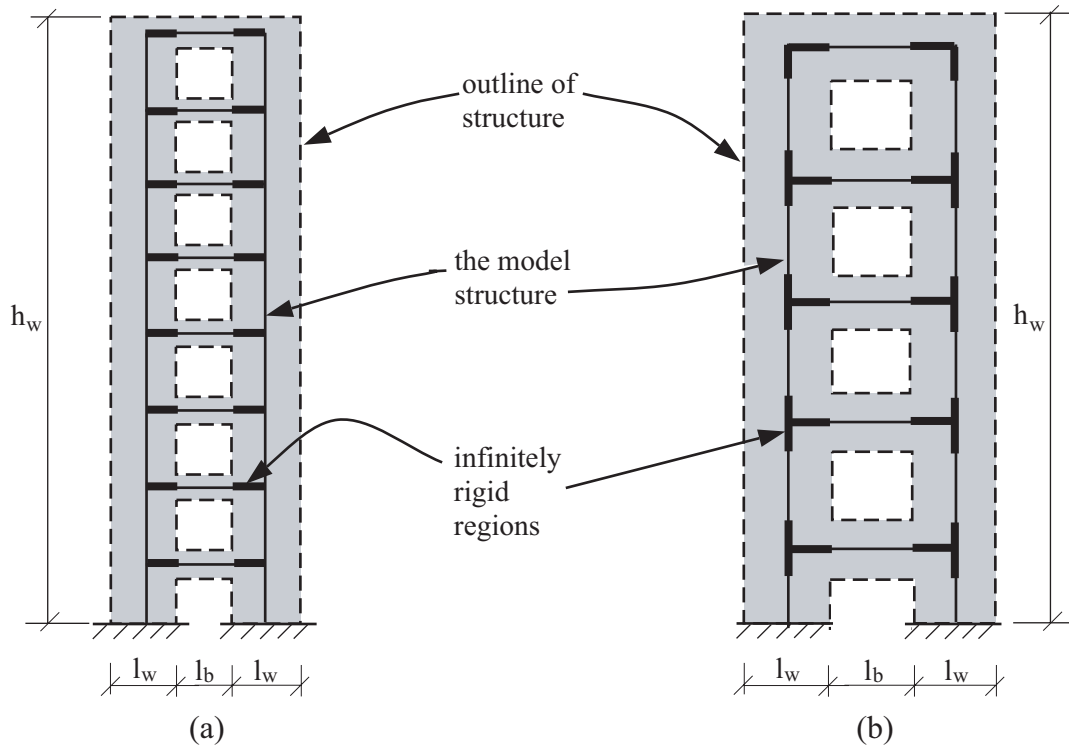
Modeling of coupled wall structures (adapted from Paulay and Priestley 1992): (a) walls with flexible beams; (b) walls with stiff beams
